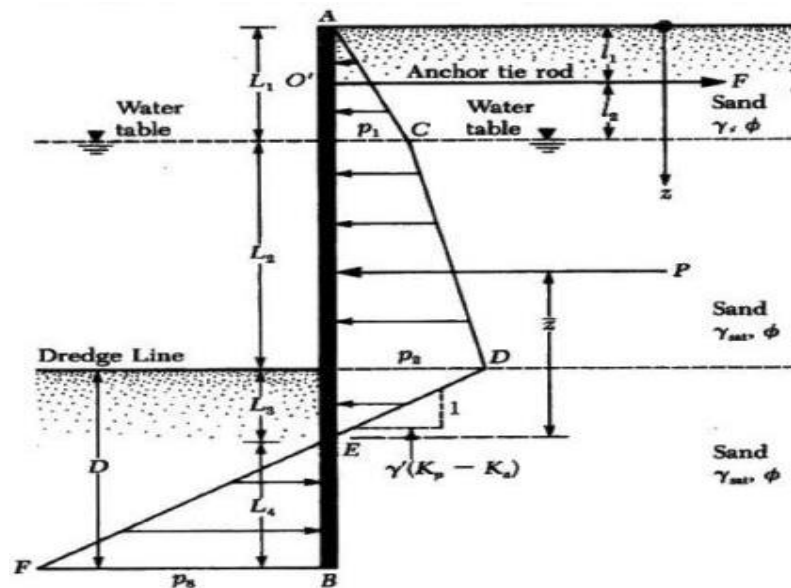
Anchored sheet pile penetrating a sandy soil (Das 1990)
